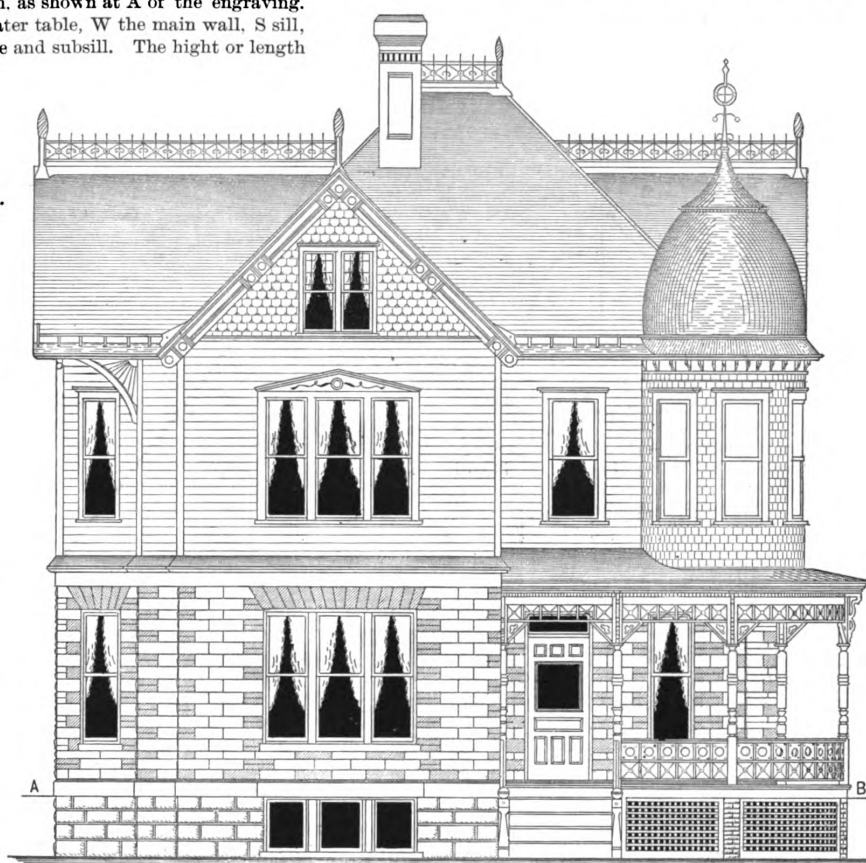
Front Elevation, Showing Method of Shading, &c.
